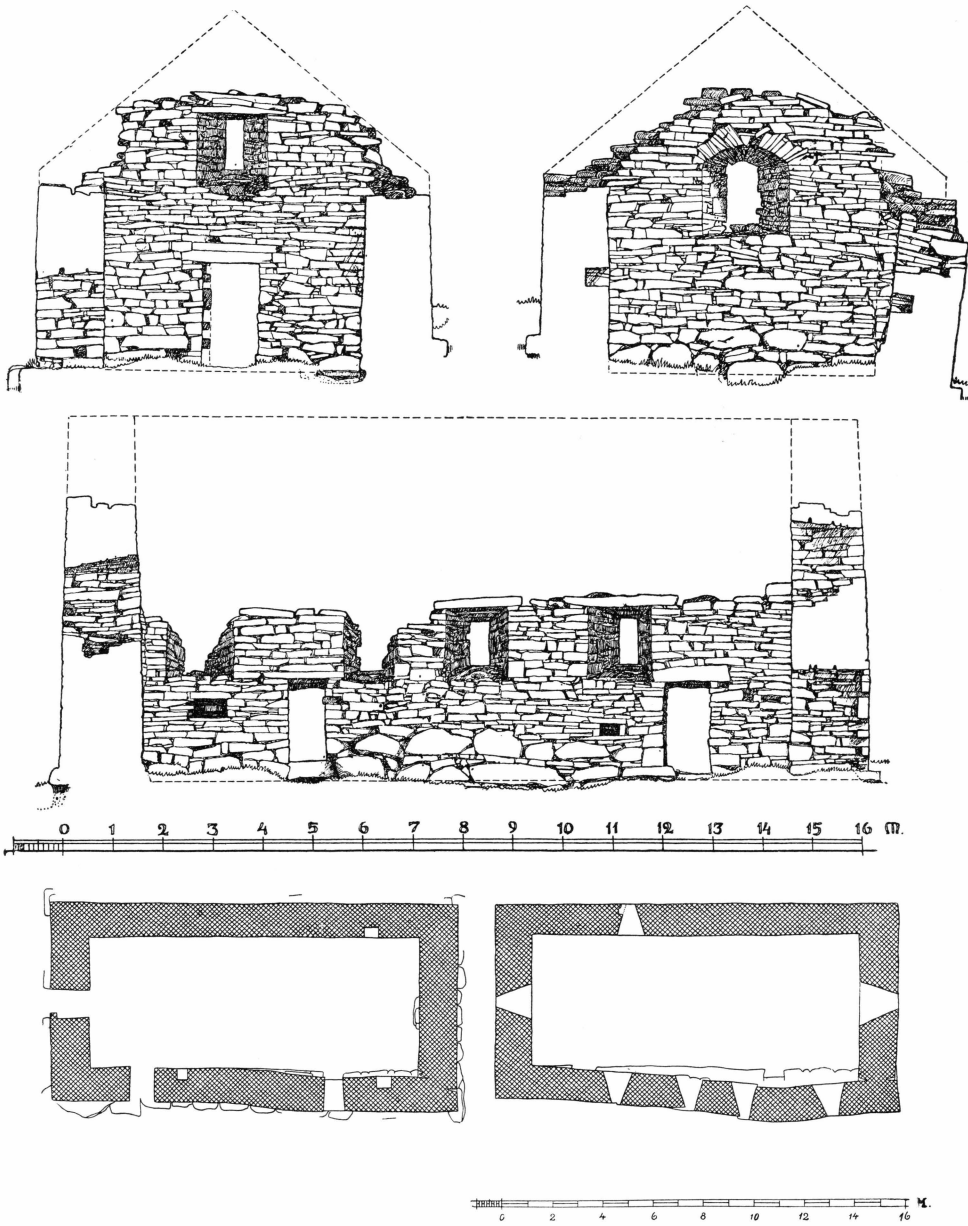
Hvalsey Church. Eastern Settlement No. 83. The church plans for ground and upper levels, 1:300. Longitudinal section looking towards the south wall, and cross sections looking towards the ends, 1:150. (From ROUSSELL, 1941, fig. 80).
